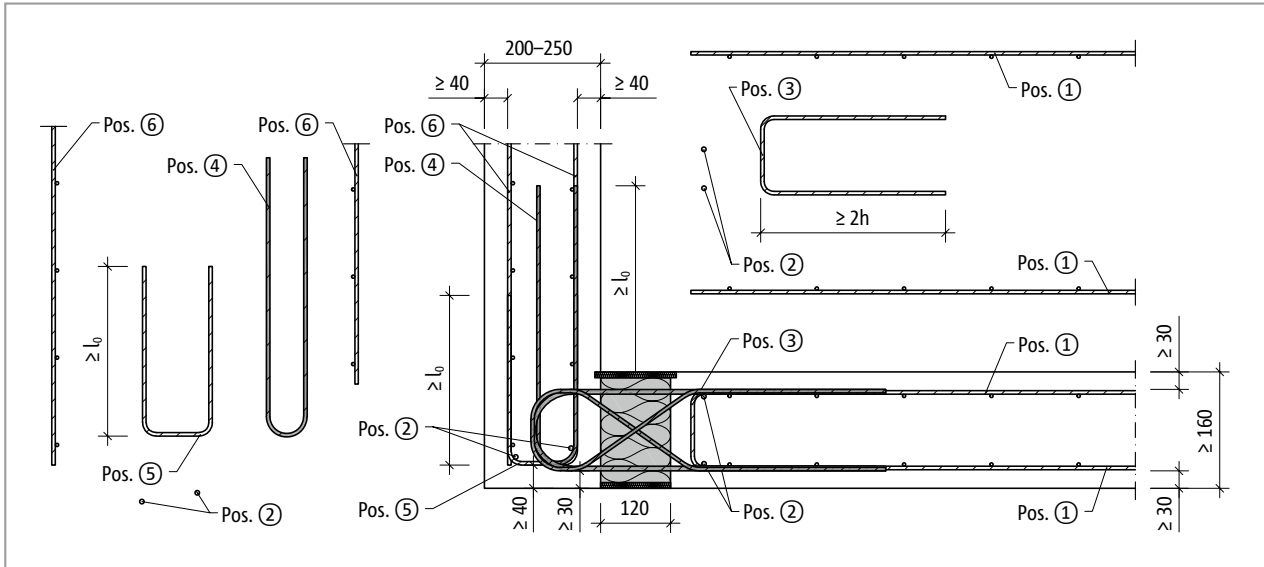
Schöck Isokorb® XT type F: On-site reinforcement with parapet/balustrade width  $b = 200 - 250$ ; on-site reinforcement  $b = 160 - 190$  such as  $b = 200 - 250$  without Pos. 5
